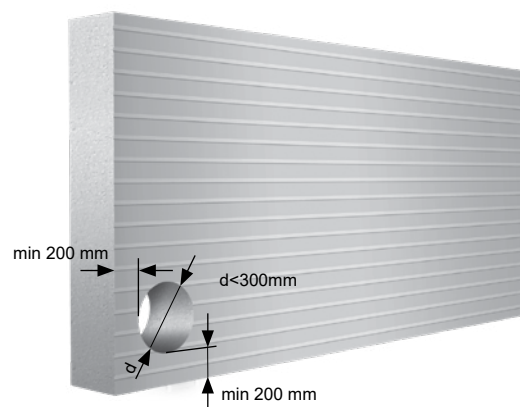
Guidelines on making small openings in PIR sandwich panels
